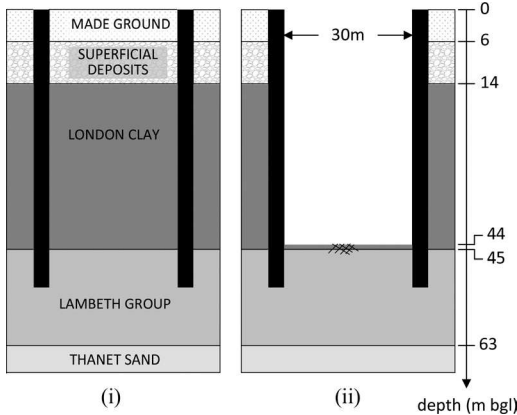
Construction sequence for Crossrail's main shaft at Limmo Peninsula which was supported by 53 m long and 1.2 m thick pre-installed diaphragm walls.
